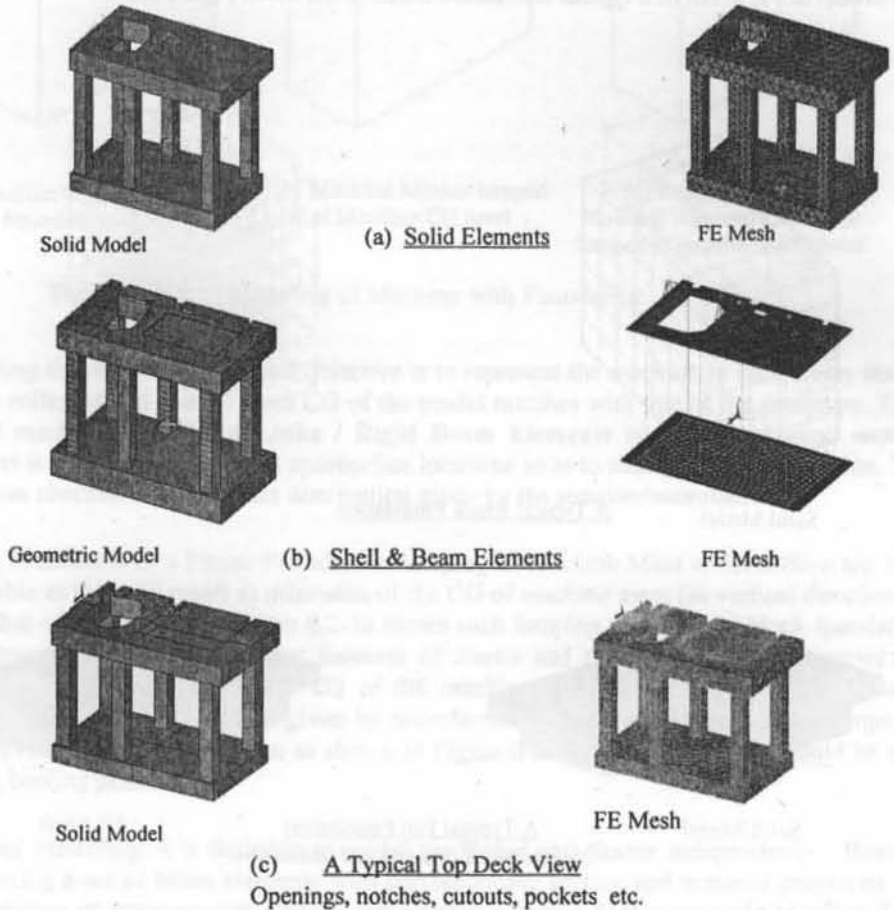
Frame Foundation – Solid Element Model & Shell Beam Model
